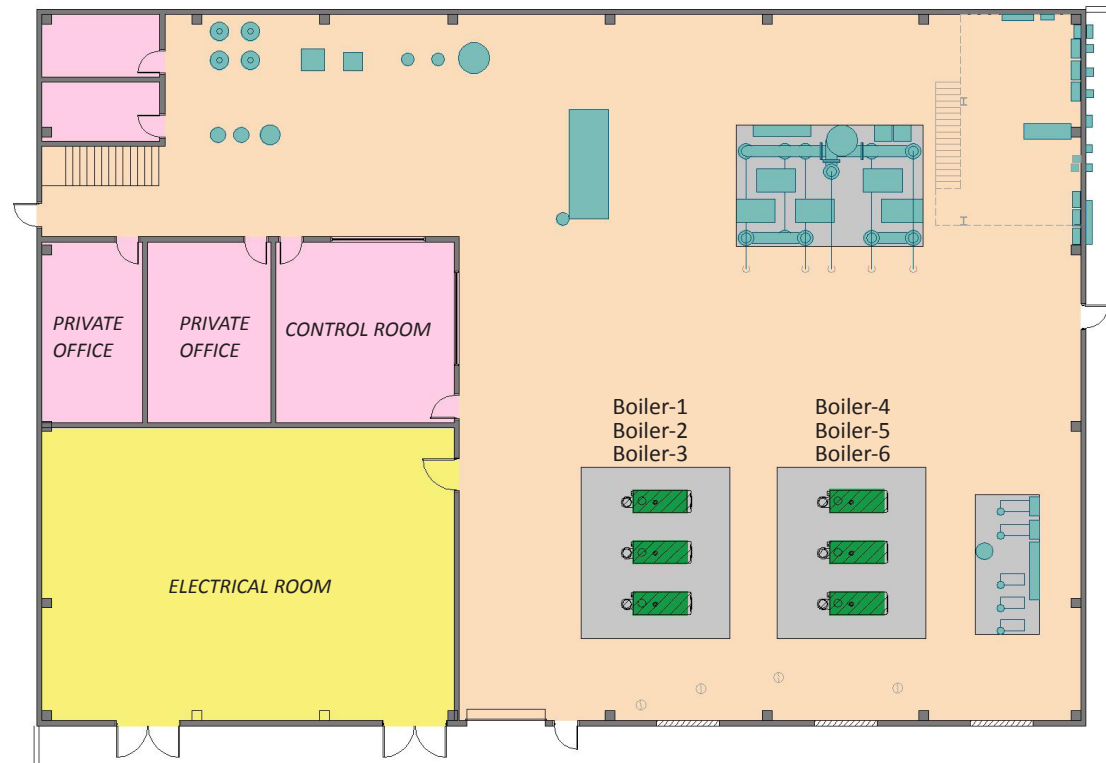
BOILER LAYOUT AT CENTRAL PLANT
